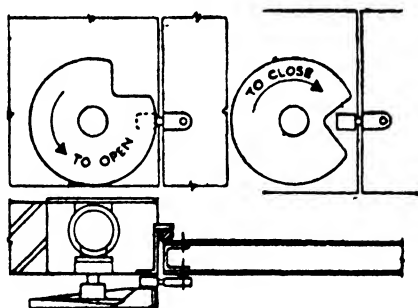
CIRCULAR CAM PLATE DOOR FASTENING DEVICE
